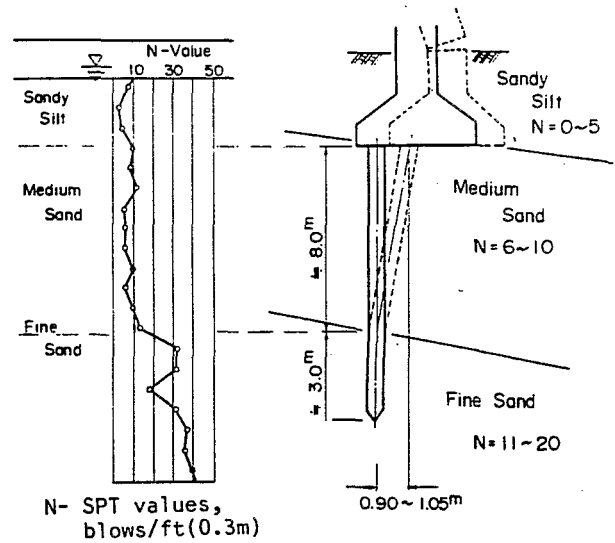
Damage to a foundation pile under Yachiyo Bridge in 1964 Niigata, Japan earthquake (Hamada, 1992a).
